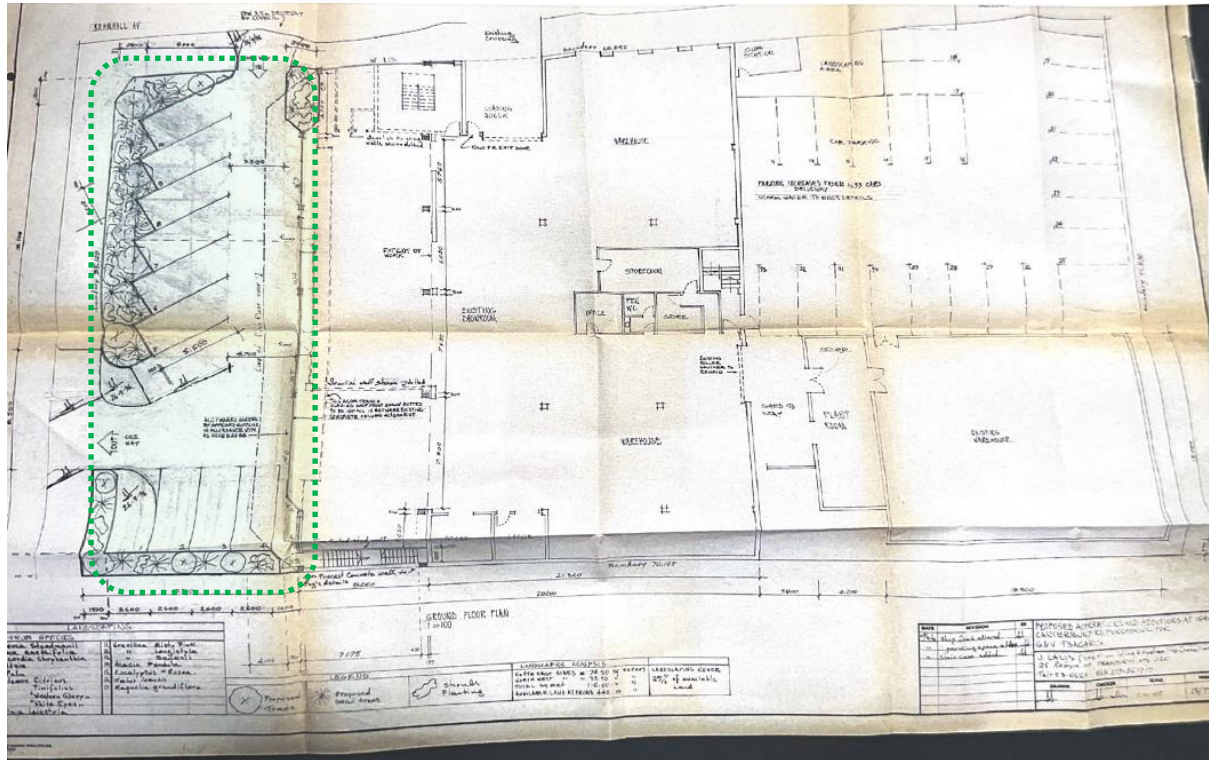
DA6317/92 Site Plan with parking spaces Source: Council
